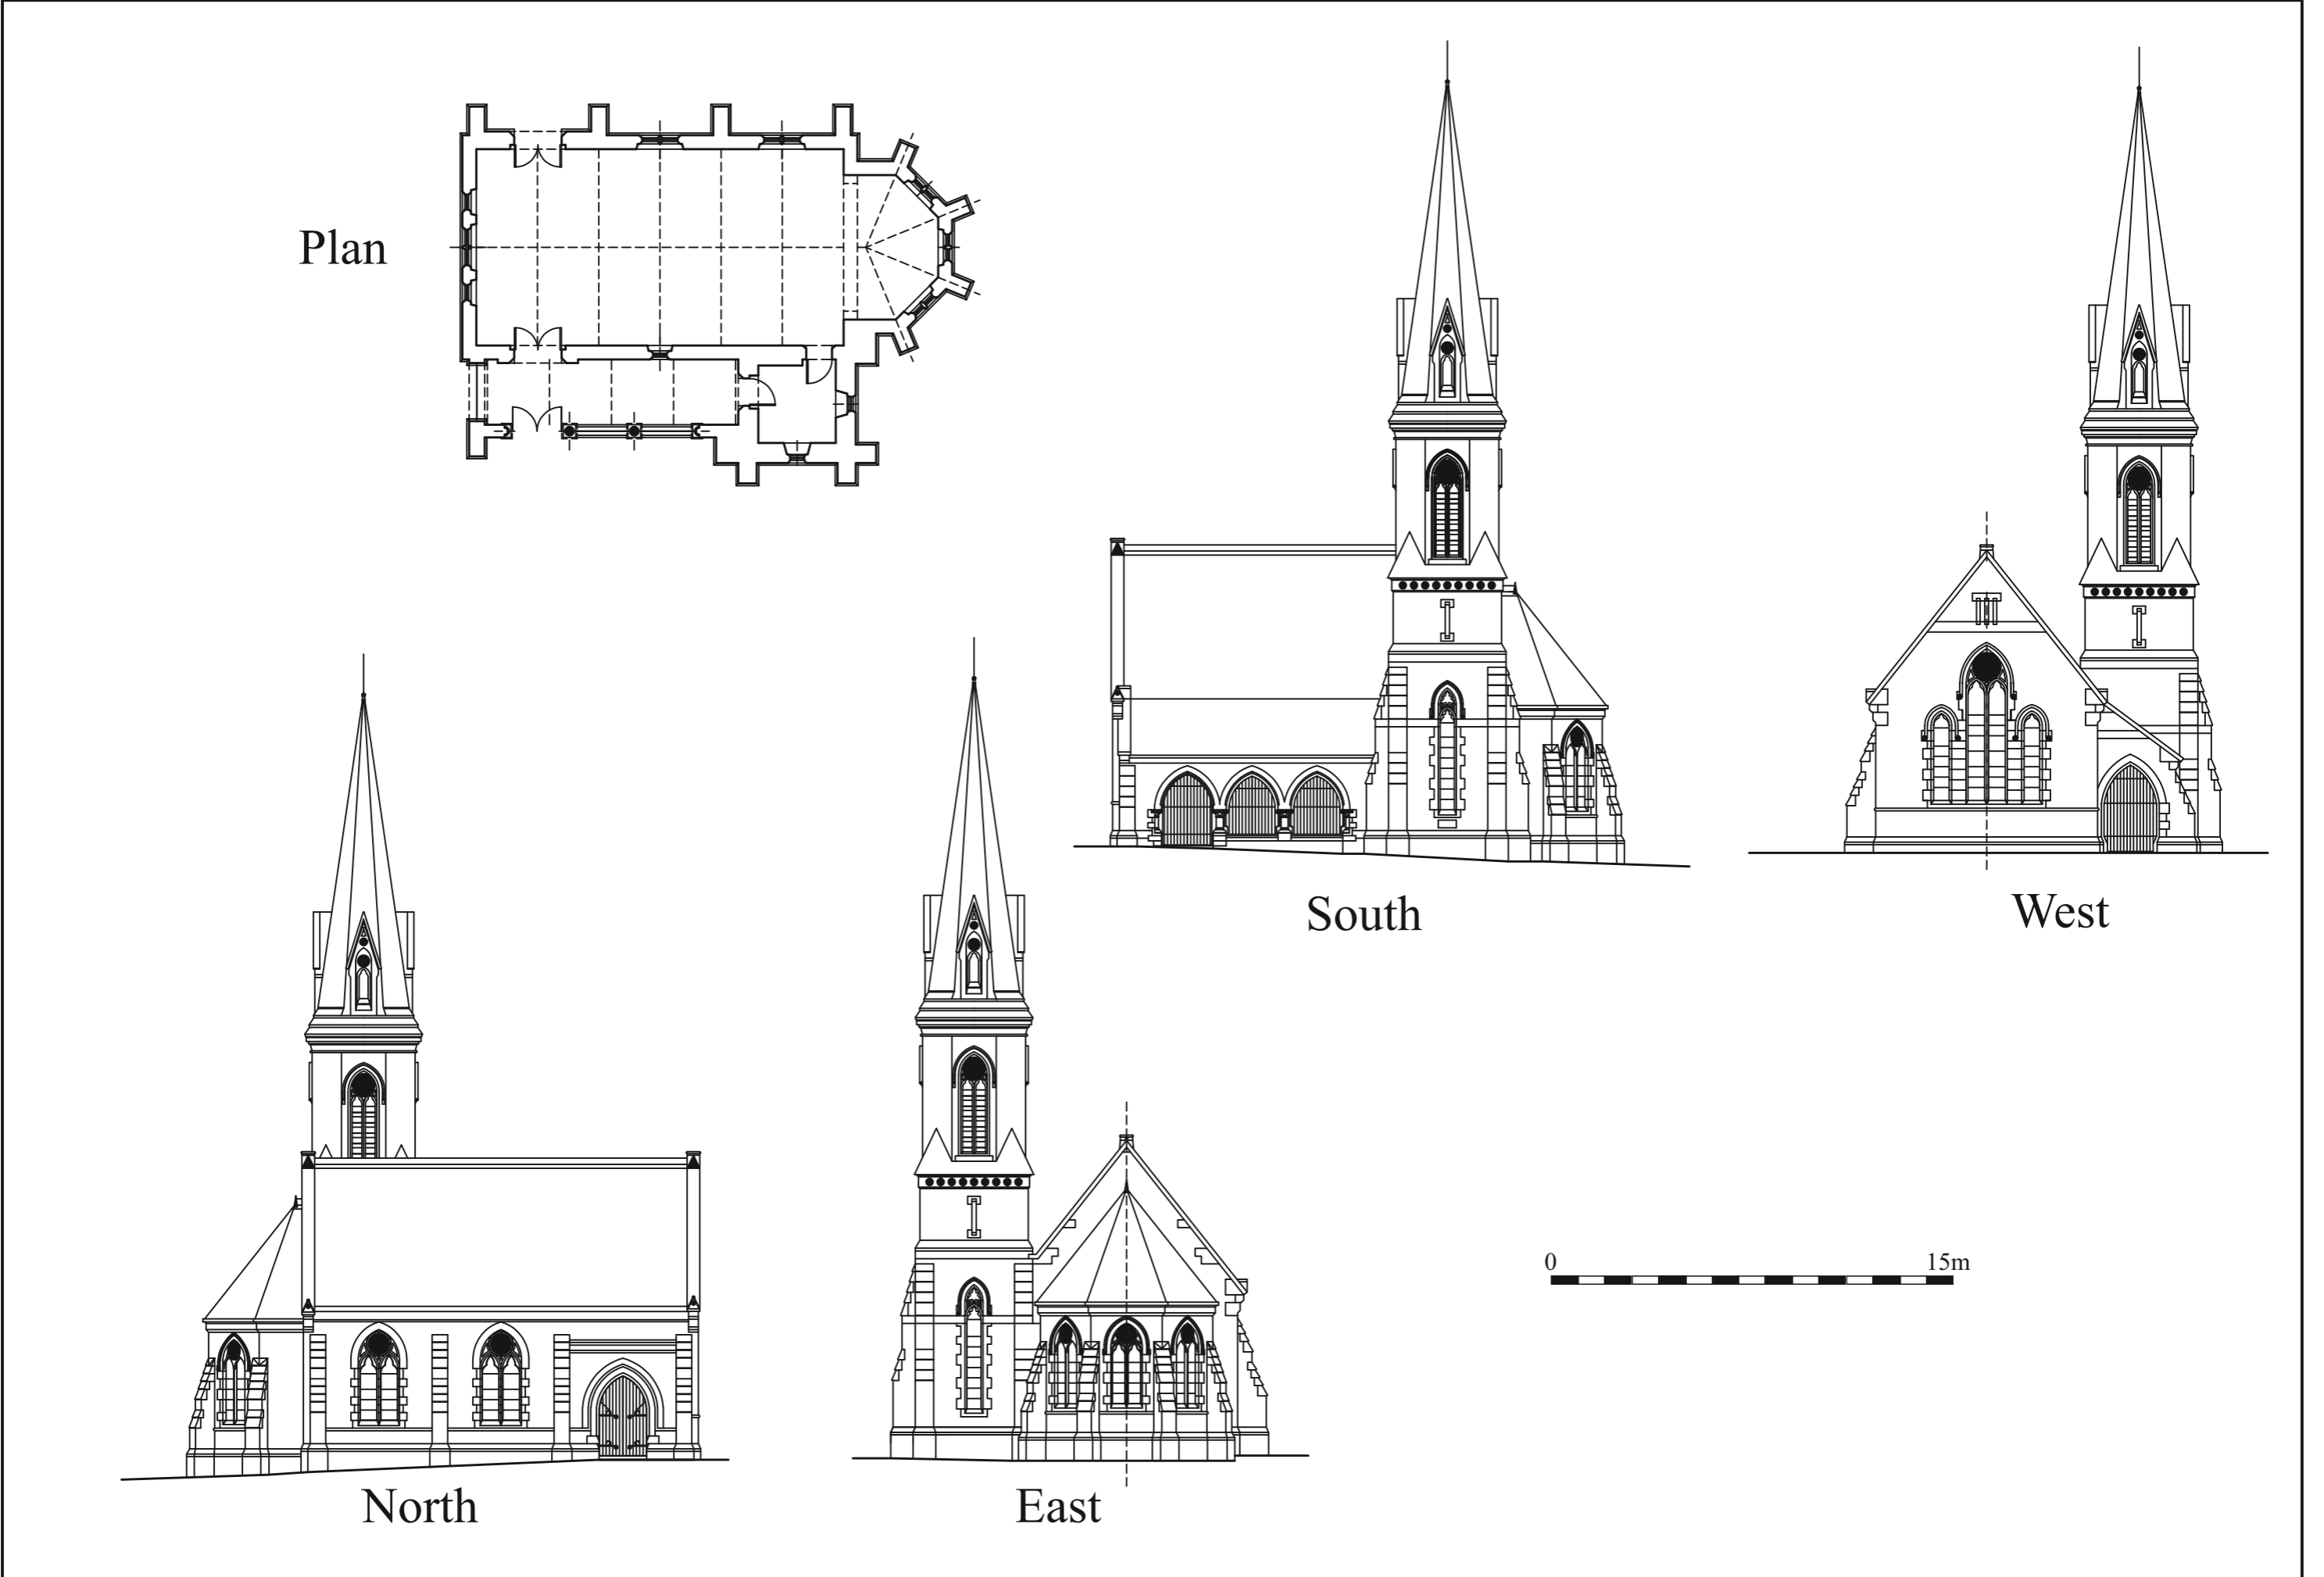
Chapel elevations and plan (courtesy of Dean-Walker Hollingworth Architects)
